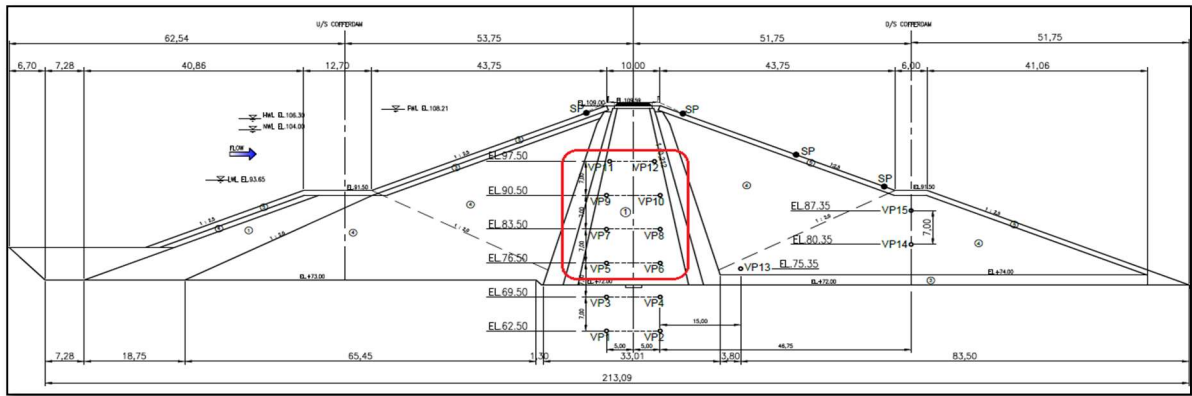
Installed vibrating wire piezometer at MD 16 cross section.
